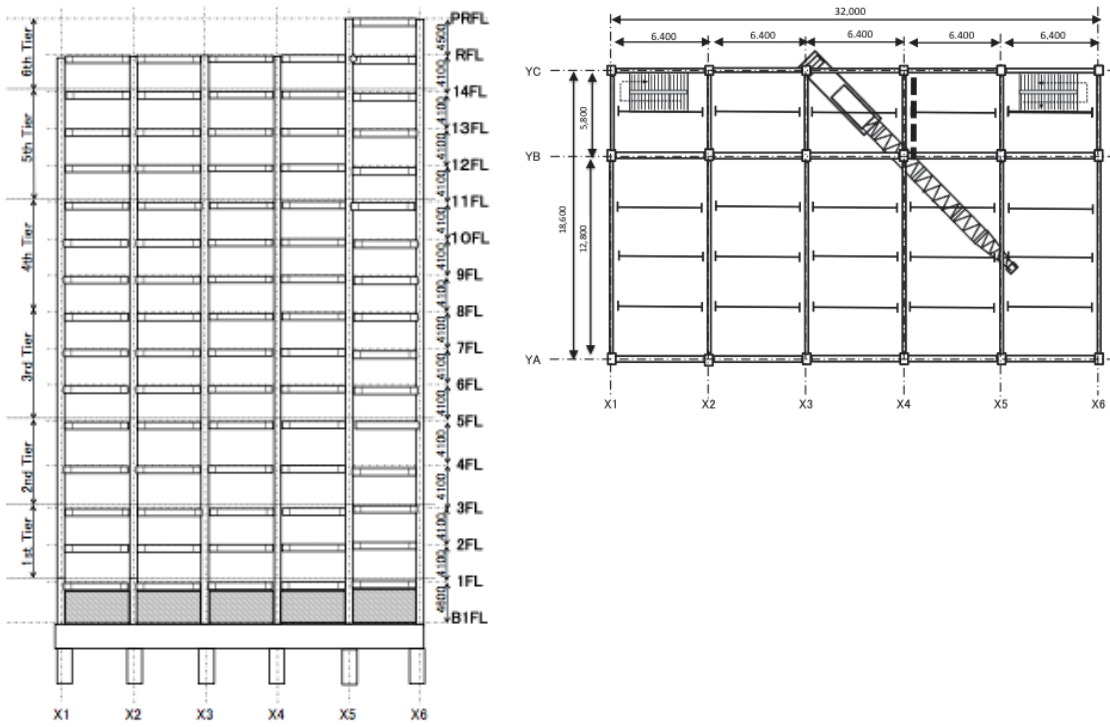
Elevation and floor plan of the S Office and location of the tower crane
